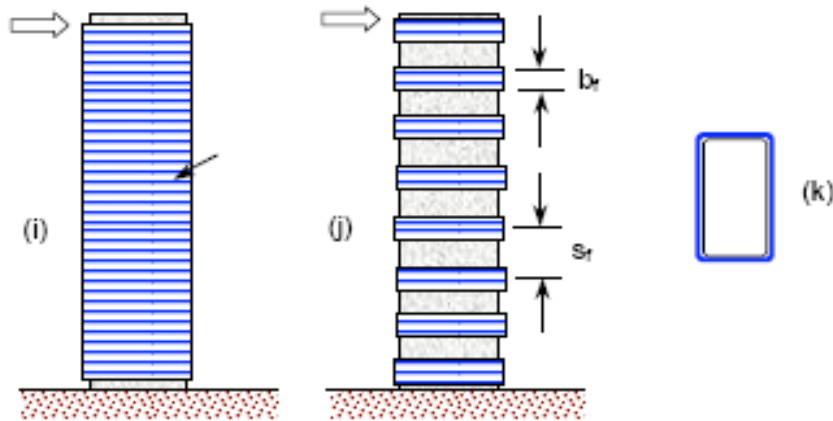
Schematic illustration of RC element strengthened in shear with externally bonded: i) complete FRP wrapping; j) discrete strips of FRP; k) four sided wrapping of columns as i) and j), after [38]
